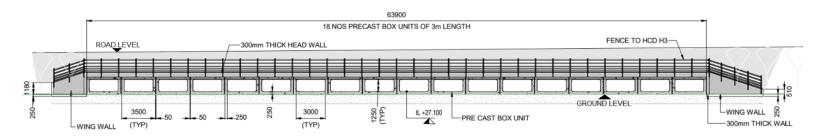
Elevation of the flood alleviation culverts in the Scheme design
